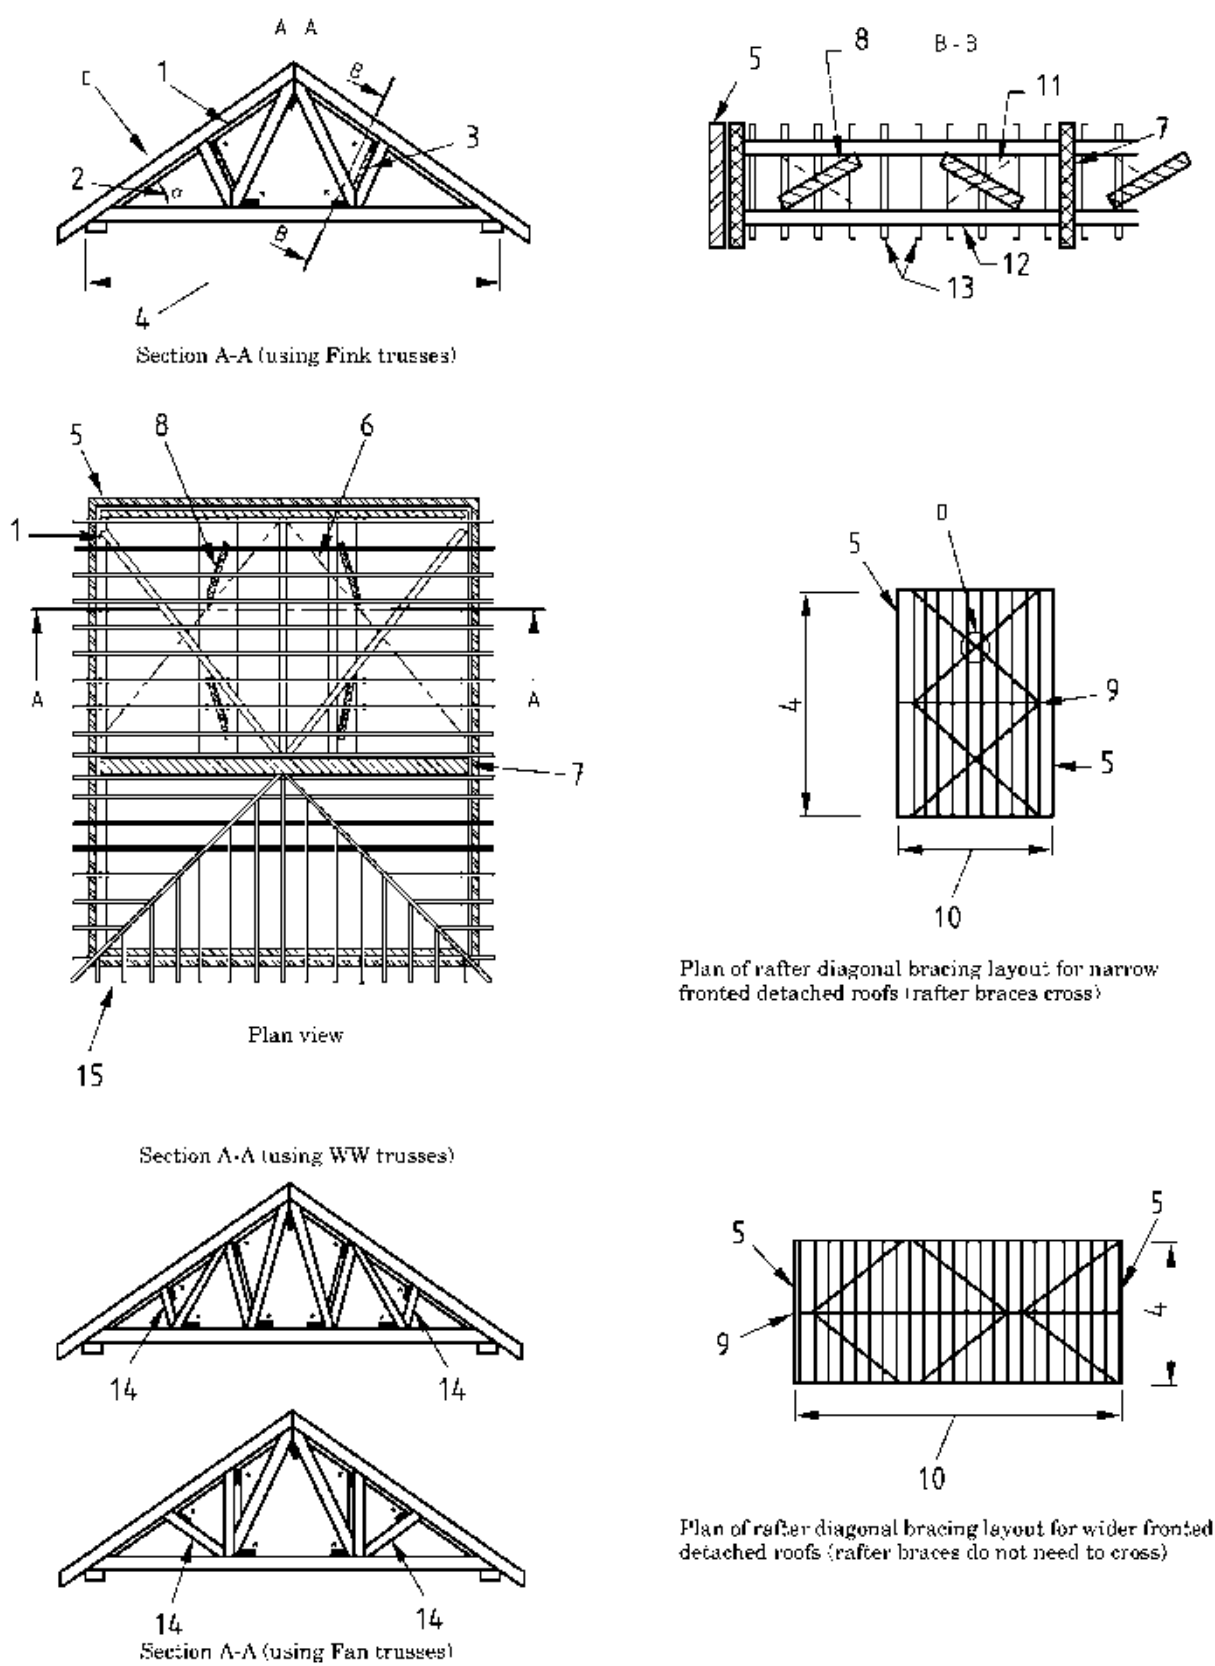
Standard bracing for rafter and web members of duopitch trussed rafters
